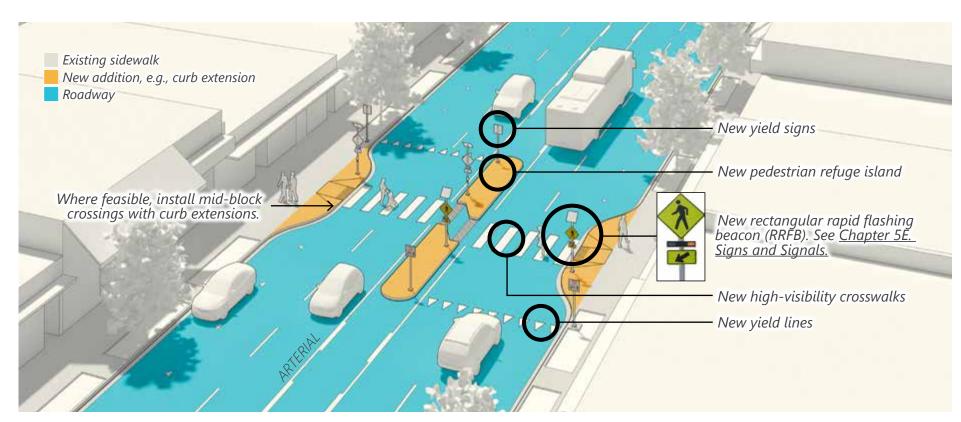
Mid-Block Crossing, Pedestrian Refuge Island, and Flashing Beacons across an Arterial Street.
